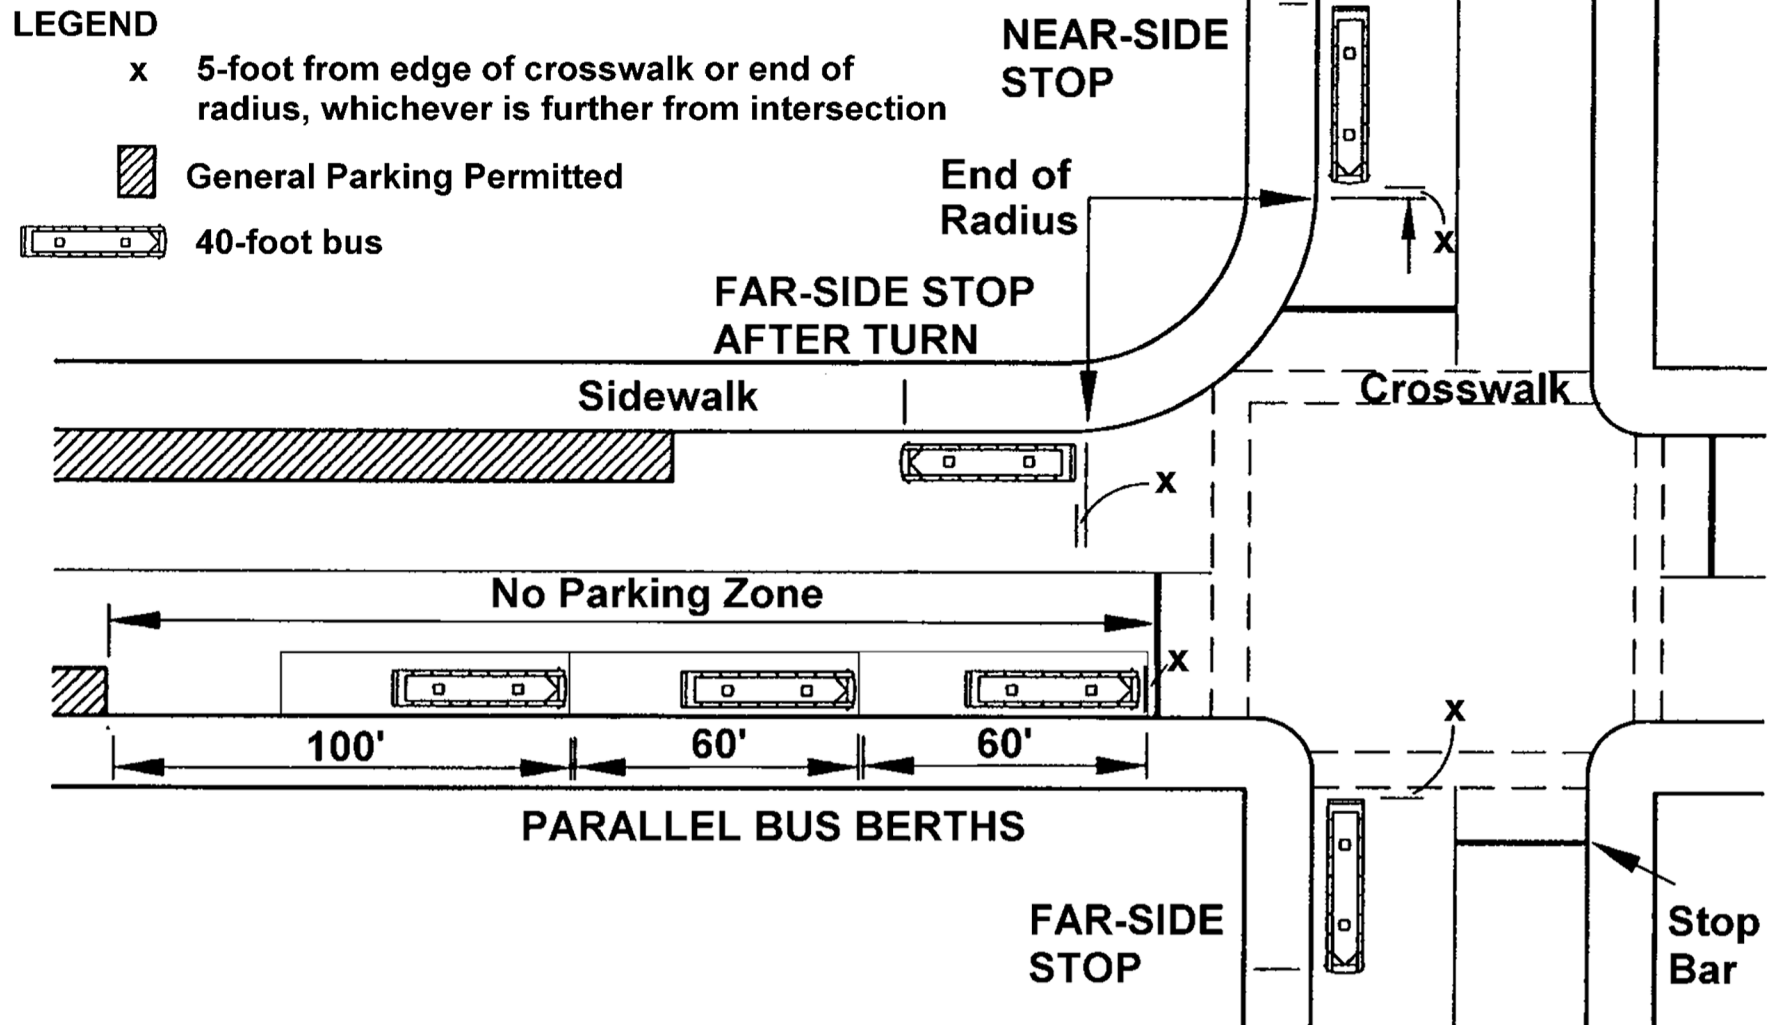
Typical Layout: Parallel Bus Berths
